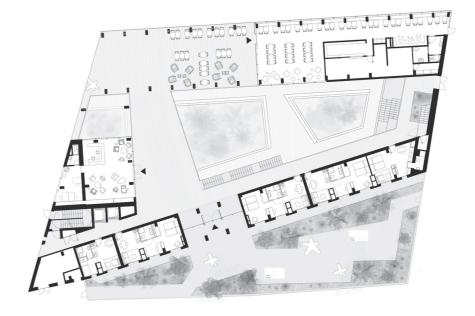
Diagonal Besòs Student Residence Groundfloor Plan Source: MDBA Architects
